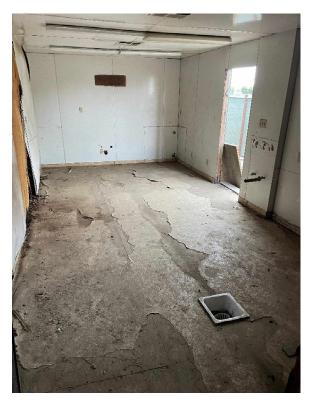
View of the floor drain in the interior of the storage building located on the western portion of the site.
